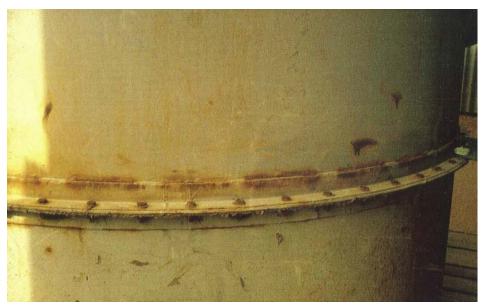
Severe corrosion is seen at a weld seam. Courtesy of KTA-Tator
